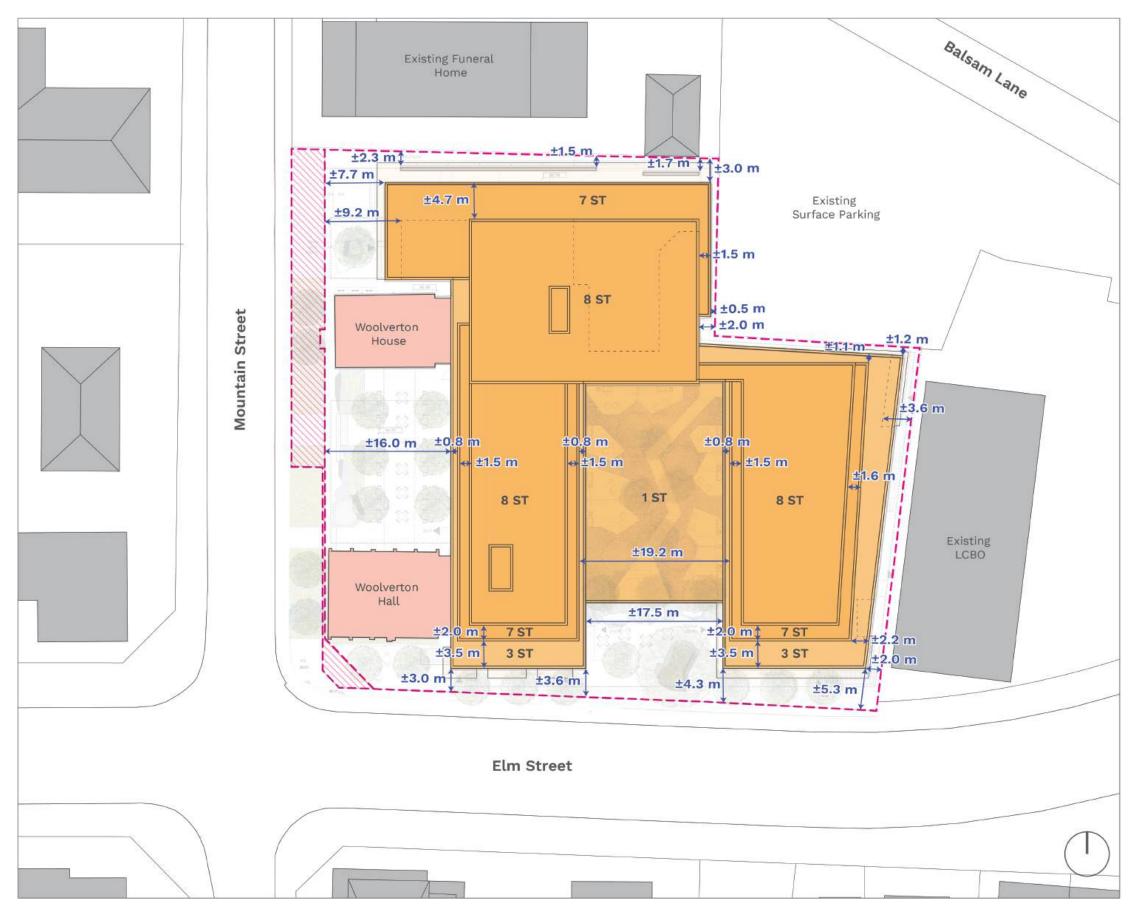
Site/Roof Plan with Setbacks & Separation Distances
